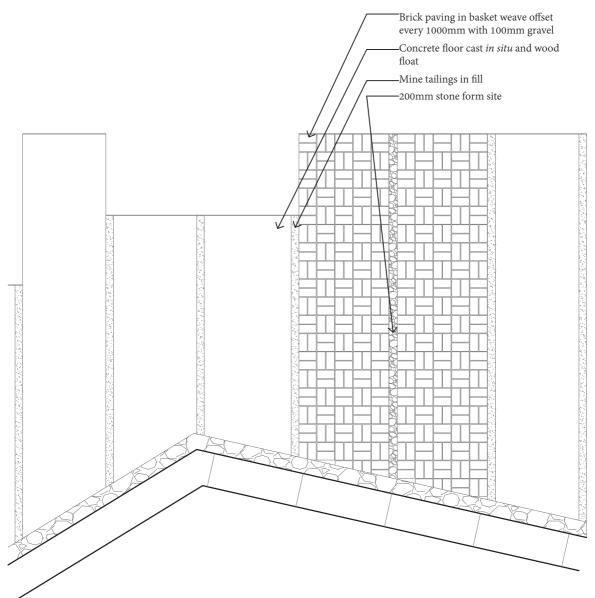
Detail C1: Paving detail around mound 1:20 scale (Author 2017)
